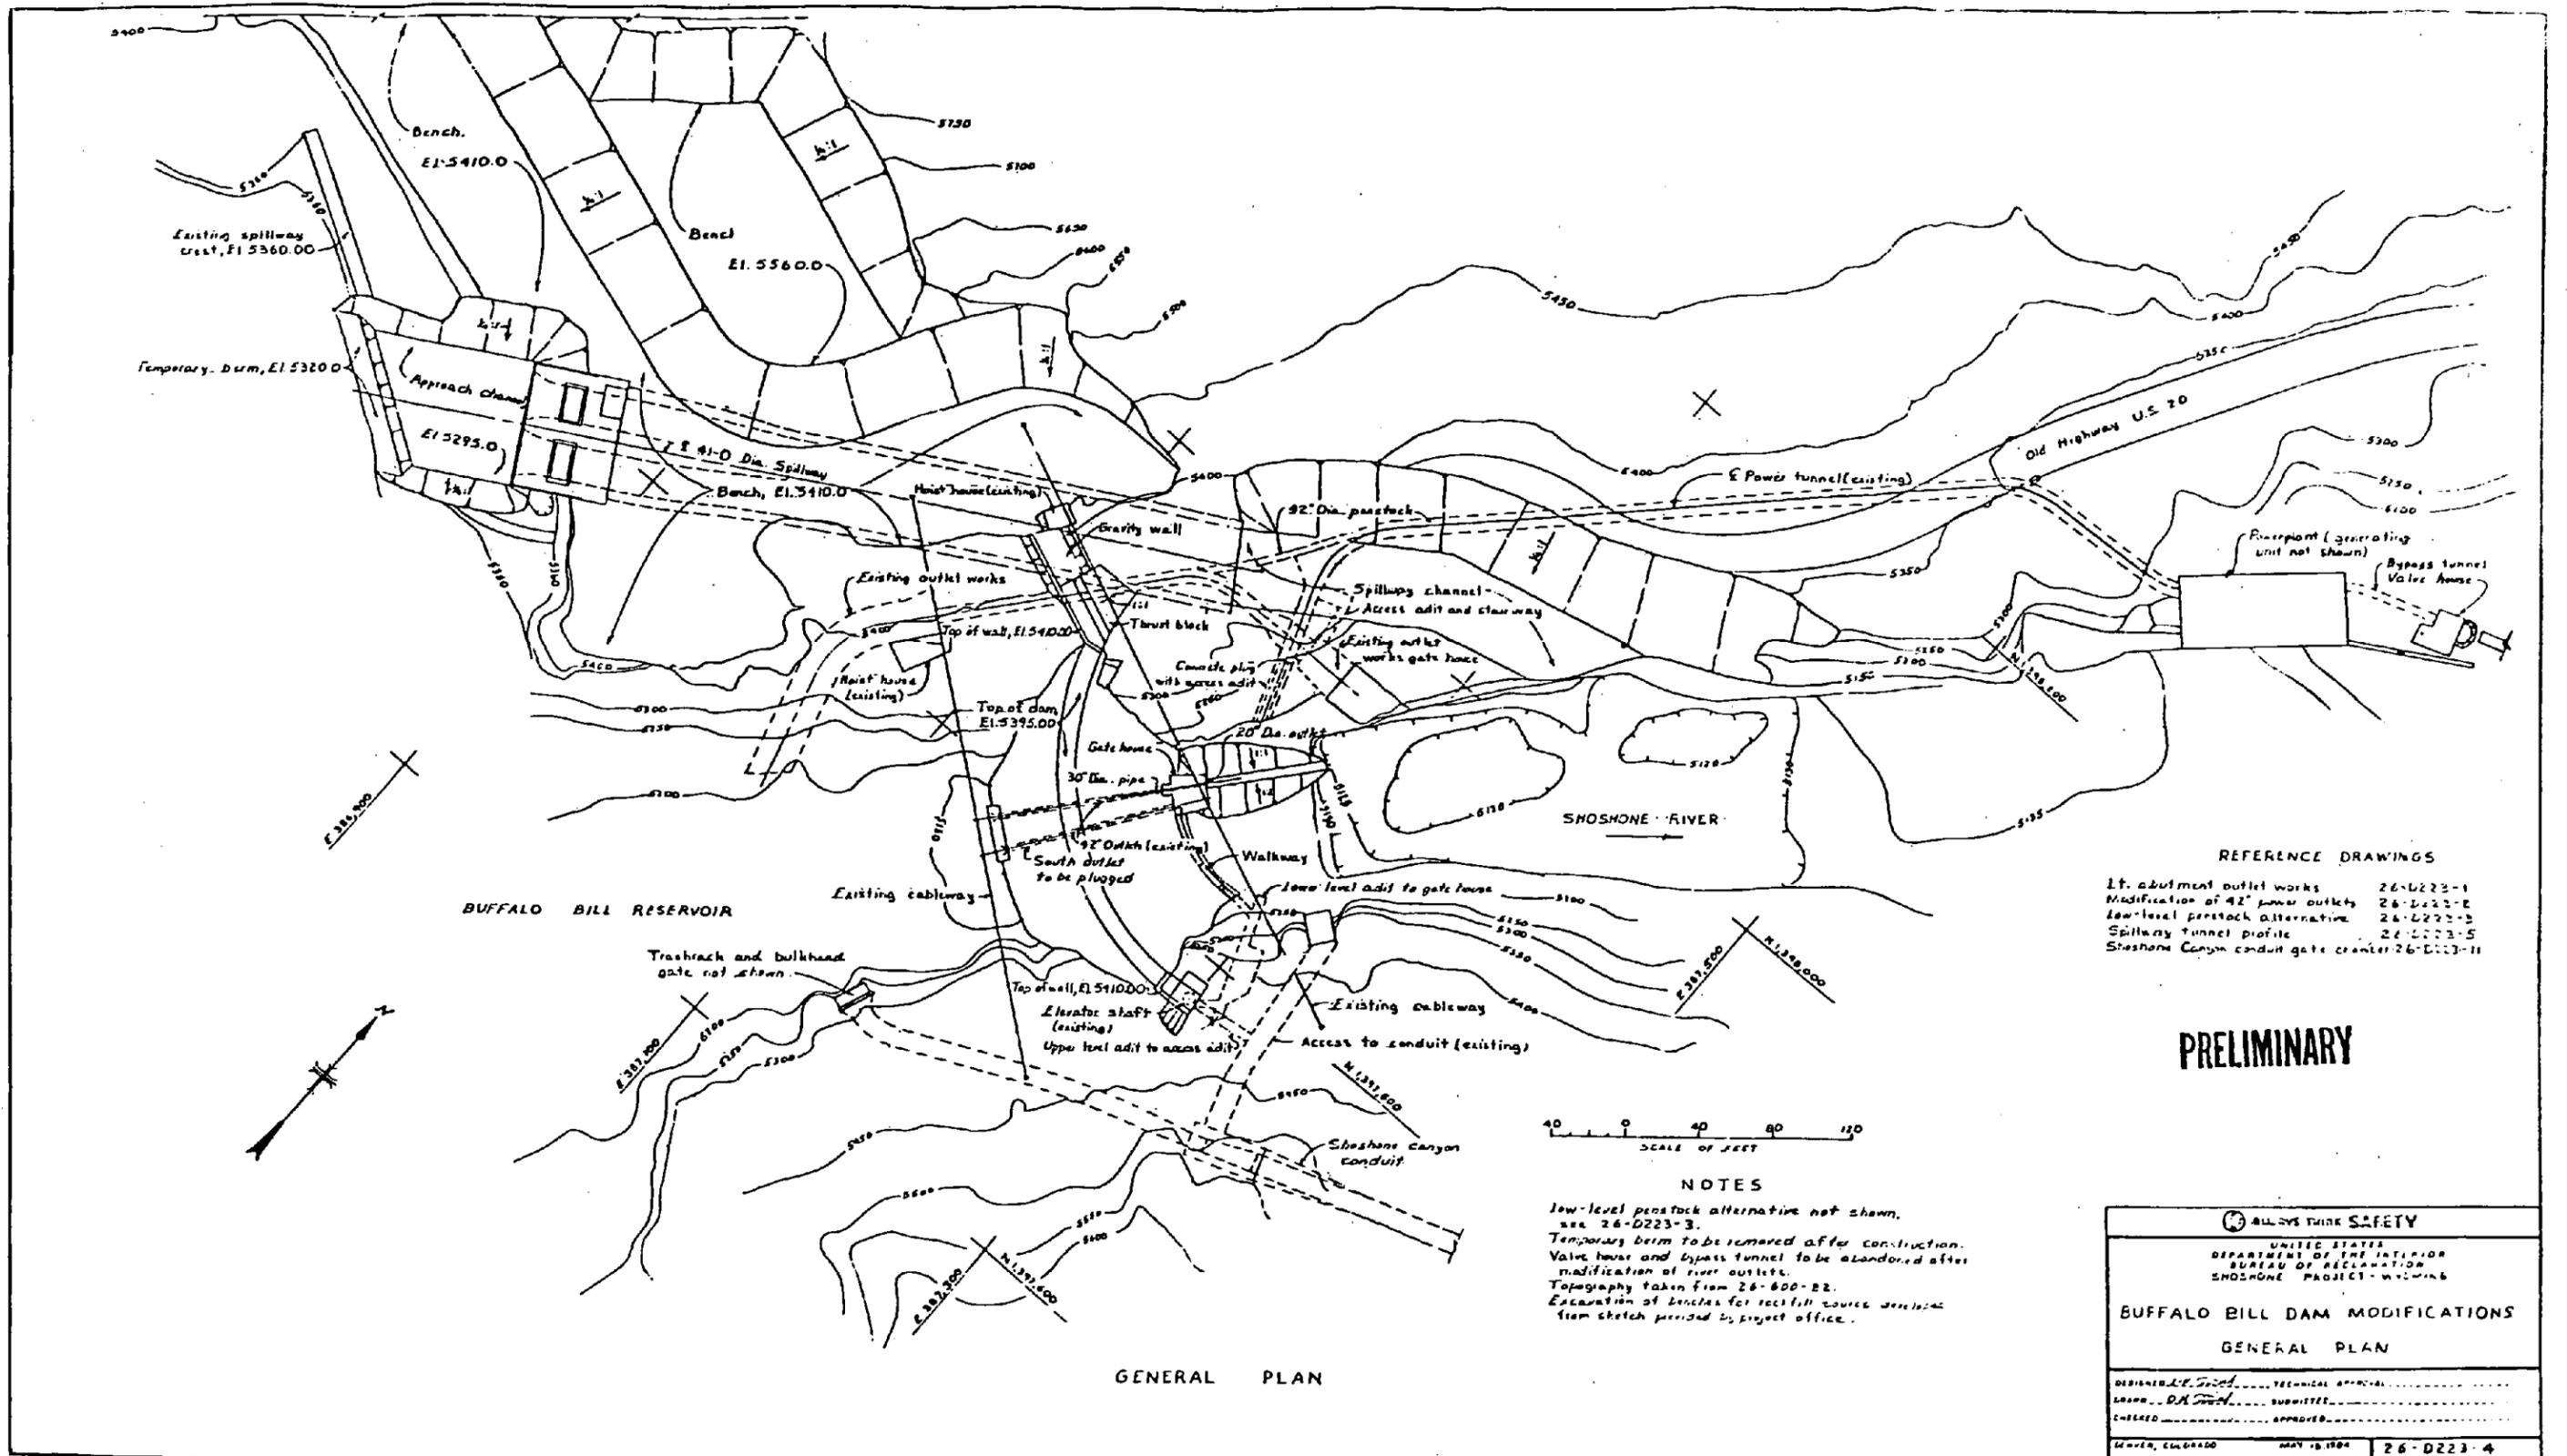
General plan of proposed spillway and dam modifications at Buffalo Bill Dam.
